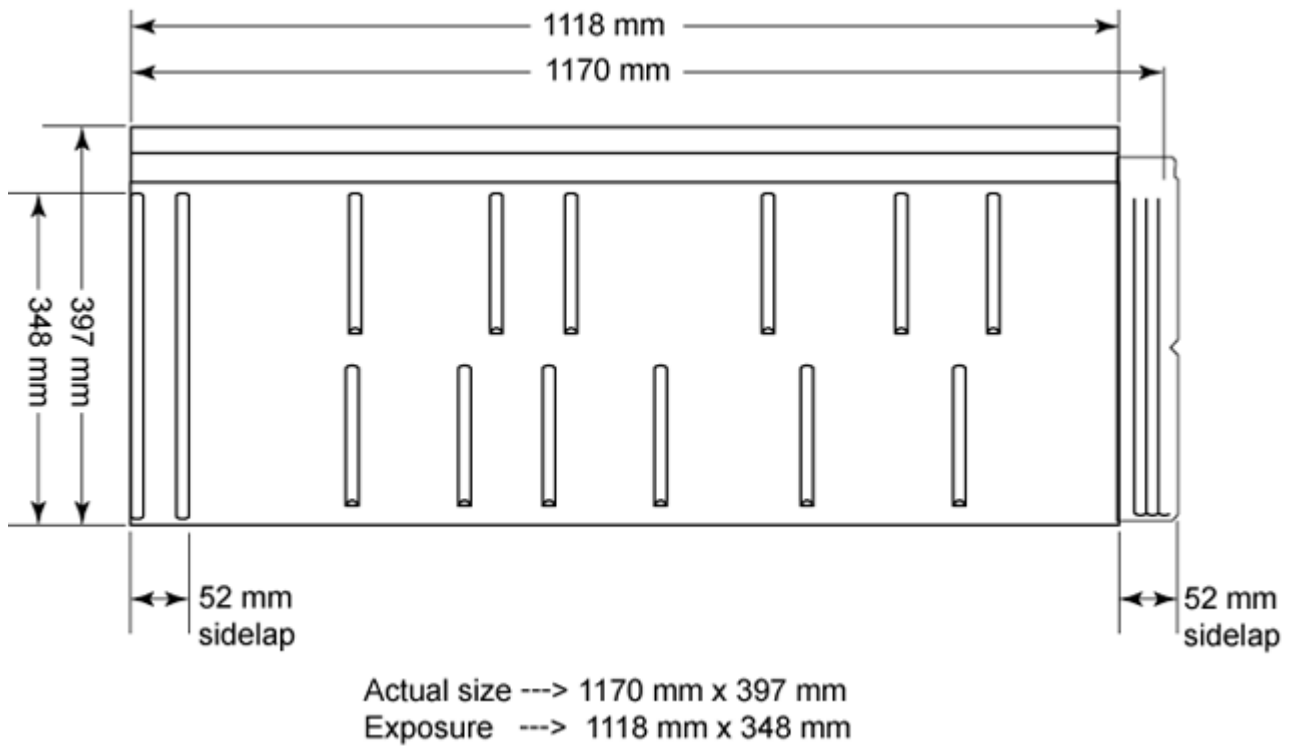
“Gerard Shingle, Granite Ridge, and Guardian Shingle” first course installation detail
